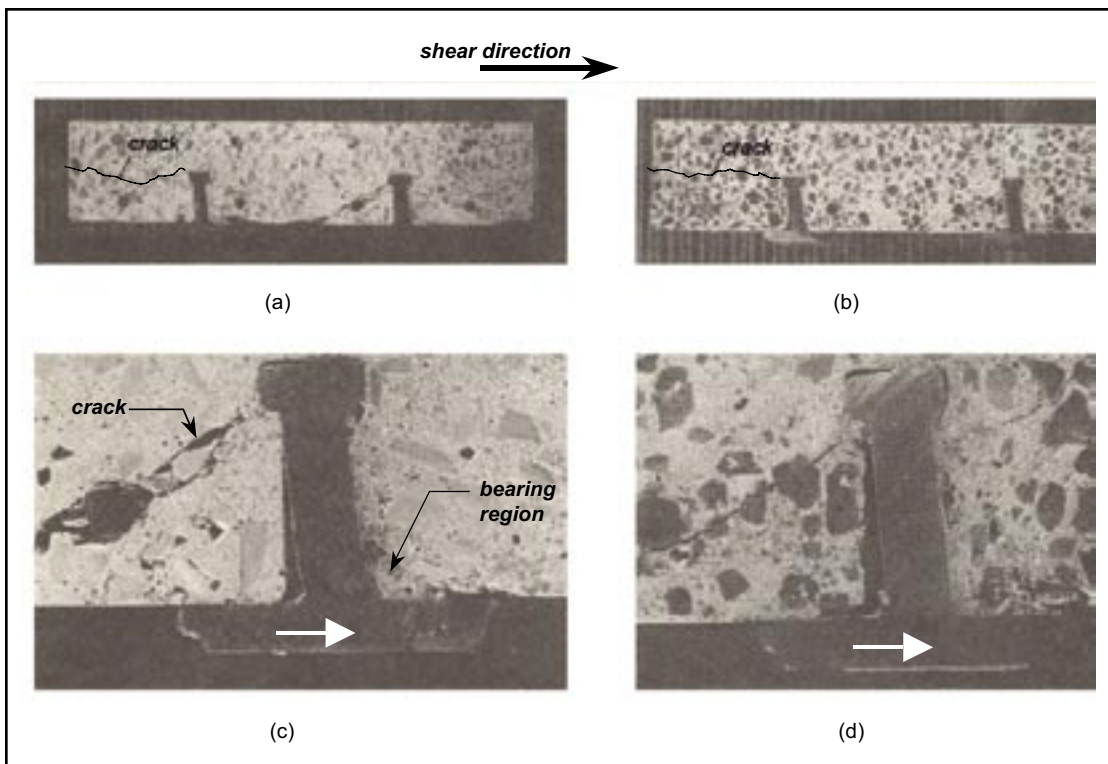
Splitting cracks in (a) and (b) observed in the rear stud of the pushoff test specimens (from Ollgaard et al.⁹): (a) Normal weight concrete (Specimen LA1); (b) Lightweight concrete (Specimen LE2); (c) Detail of front stud (Specimen LA1); (d) Detail of front stud (Specimen LE2). Note: Splitting cracks in (a) and (b) traced for reproduction purposes.
